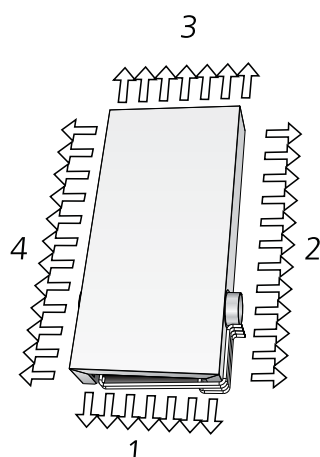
Top view nozzle setting doublemodule unit side 1-4.
